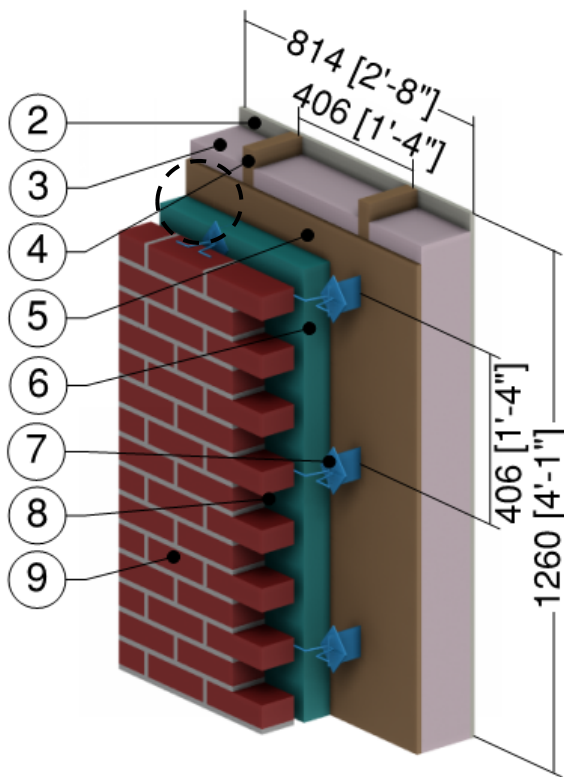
Exterior and Interior Insulated 2x6 Wood Stud (16" o.c.) Wall Assembly with Brick Ties Supporting Brick Veneer and R-19 Batt Insulation in Stud Cavity – Clear Wall
